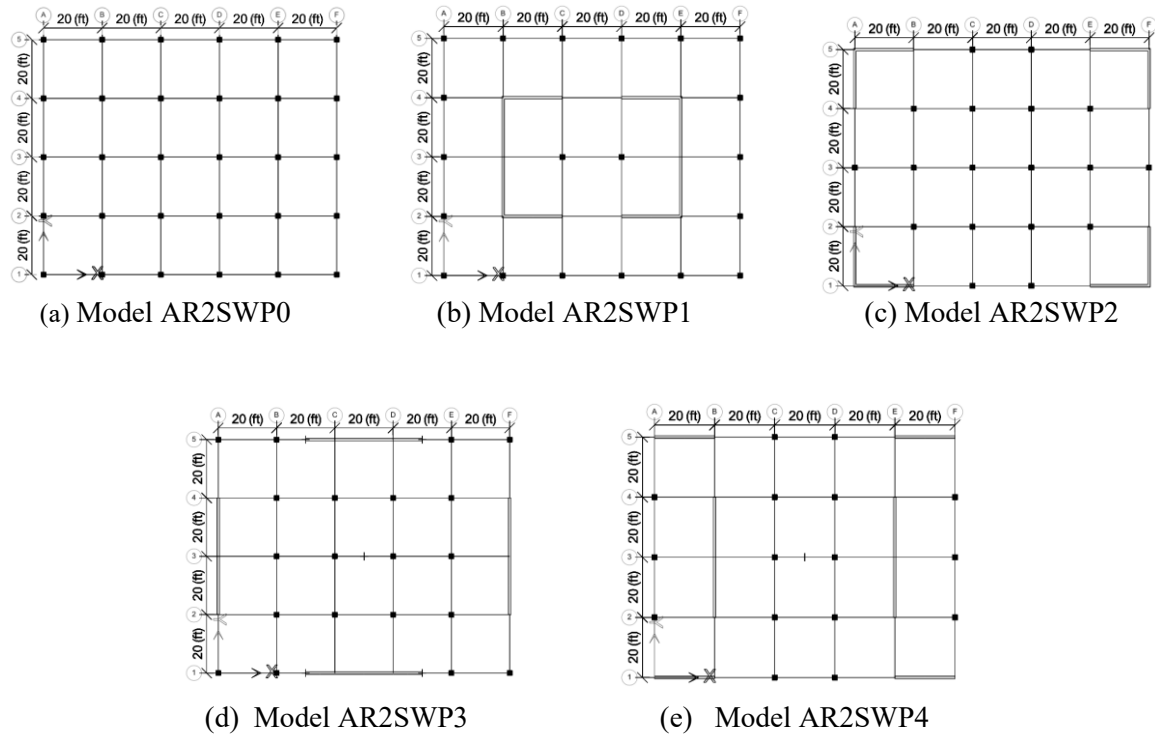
Shear-wall layout plans for aspect ratio 1:1.25
